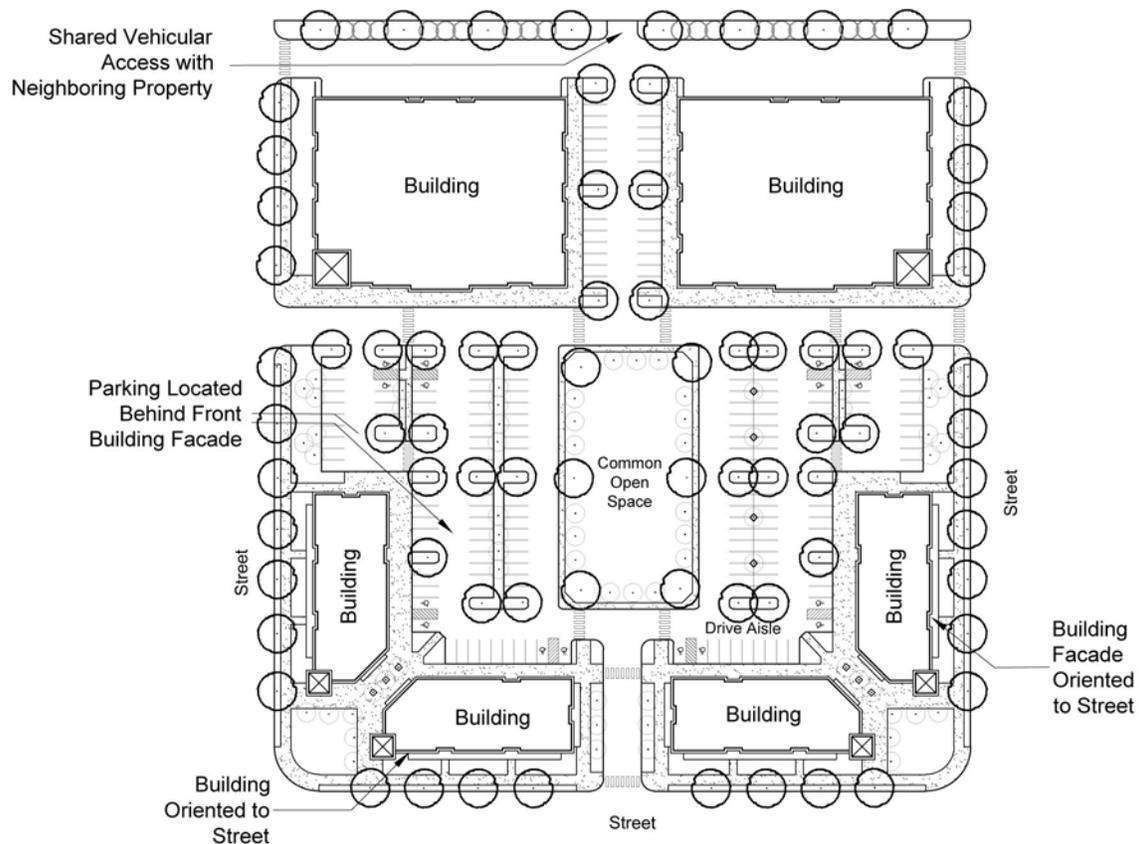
(c). – Site Layout – Parking Design Standards
